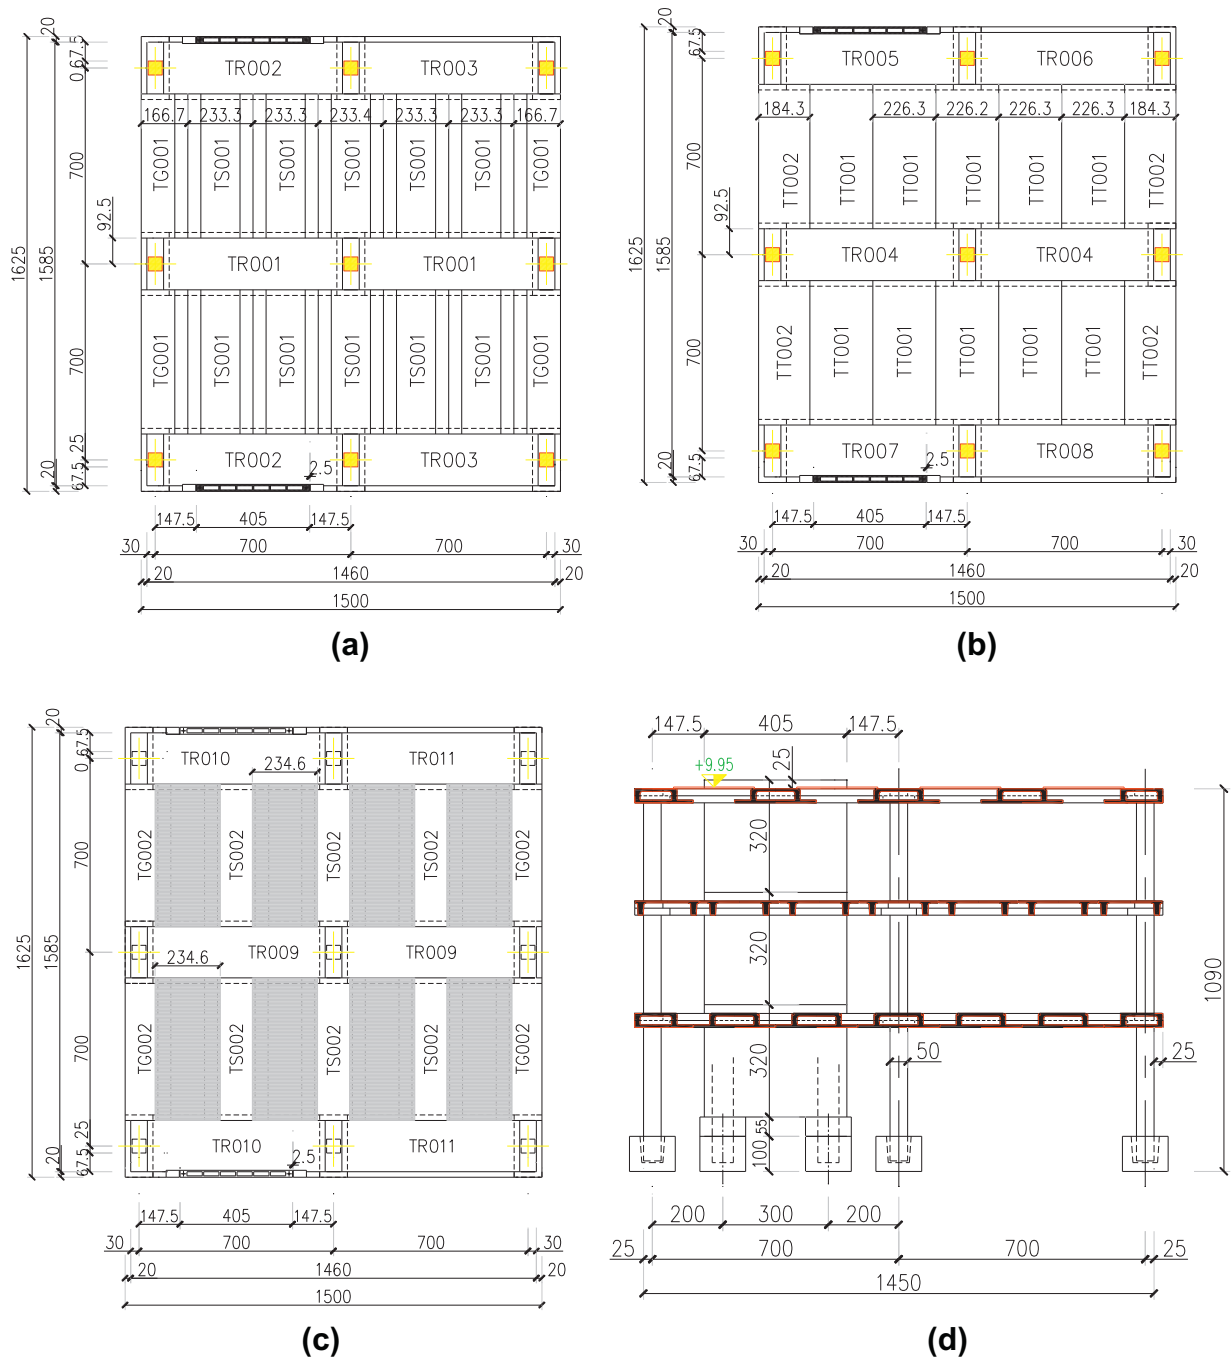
Plan view of the mock-up at the: (a) First-floor level. (b) Second-floor level. (c) Third-floor level. (d) Section view of the mock-up (dimensions in cm).
